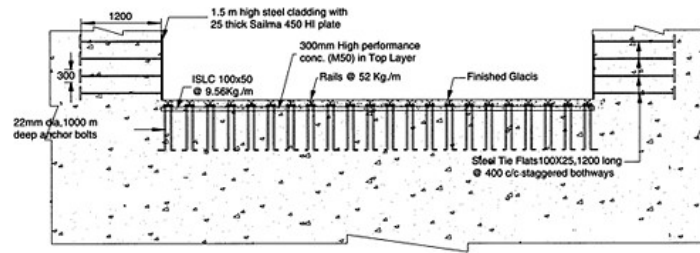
Wangkha dam—cross section showing protection works downstream of radial gates.
